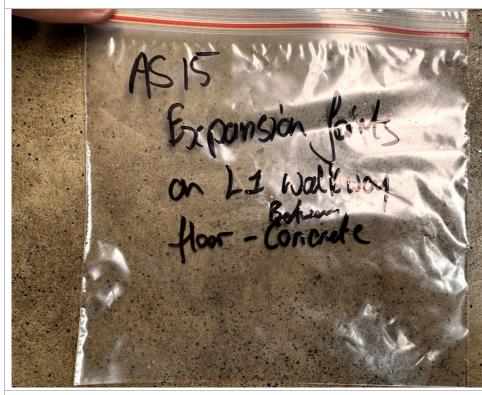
JVB – Sample 15 (S15): Sample of concrete expansion joints
